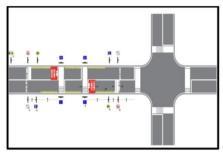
ZoSS at Type 2/2 UD Road Intersection
